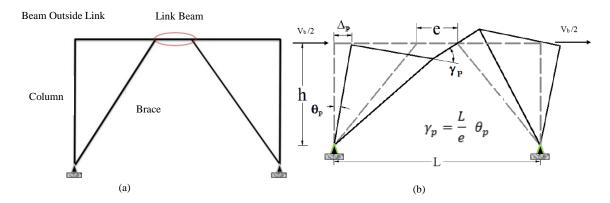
Typical EBF Geometric Configuration: (a) Chevron EBF shape, (b) deformed shape, Adapted from: [3]. PROPOSED ACCEPTANCE CRITERIA FOR EBFS AS BRIDGE PIERS
